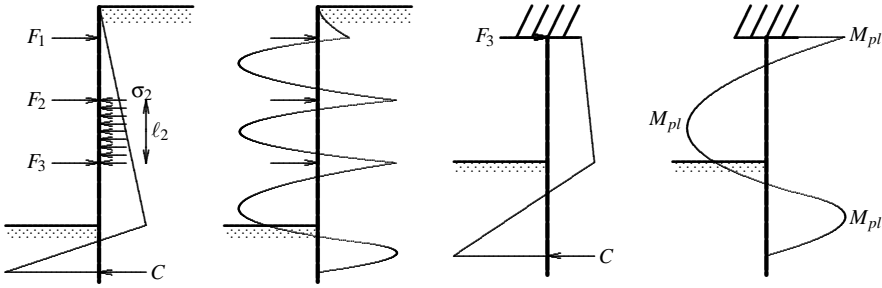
Braced sheet pile wall (according to Windels [94])
